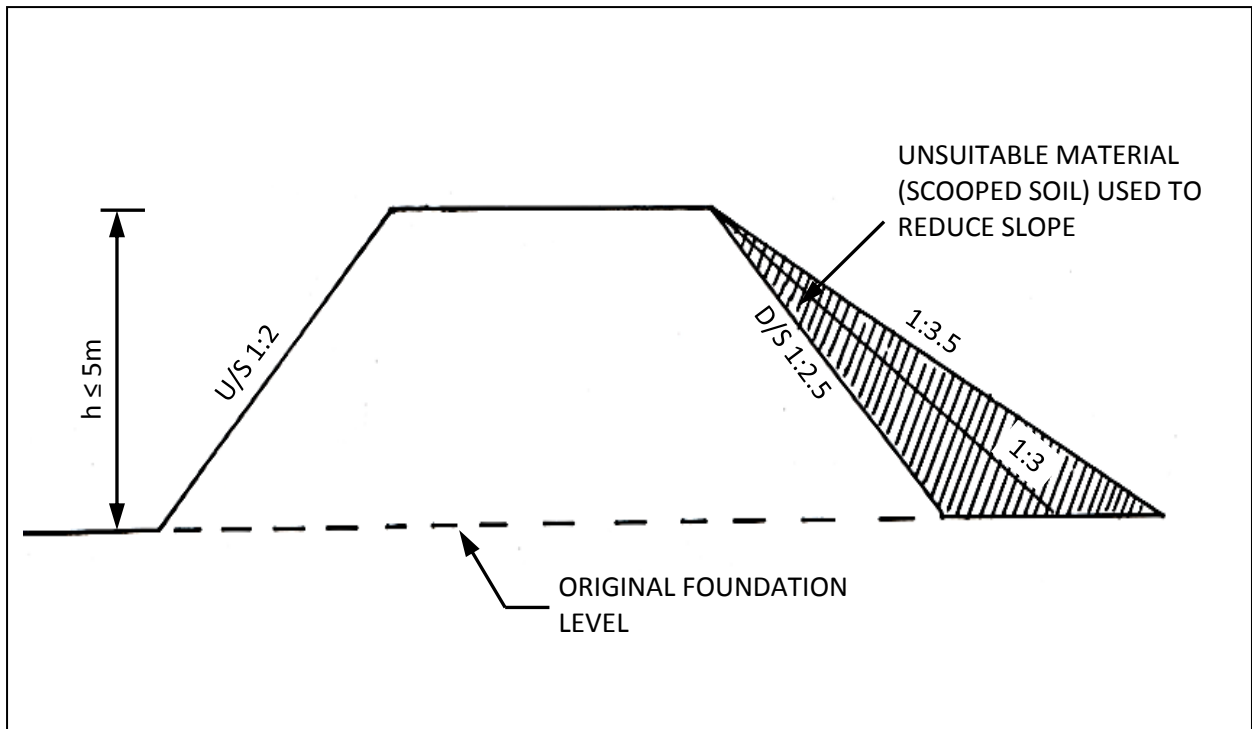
Use of Scooped Soil to Reduce Downstream Slope
